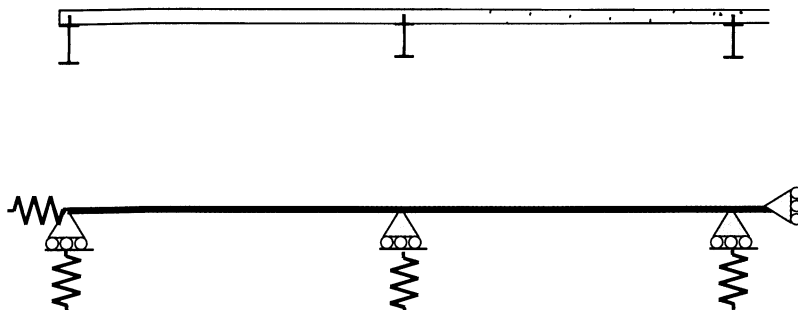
Cross-section through typical composite slab and structural representation
